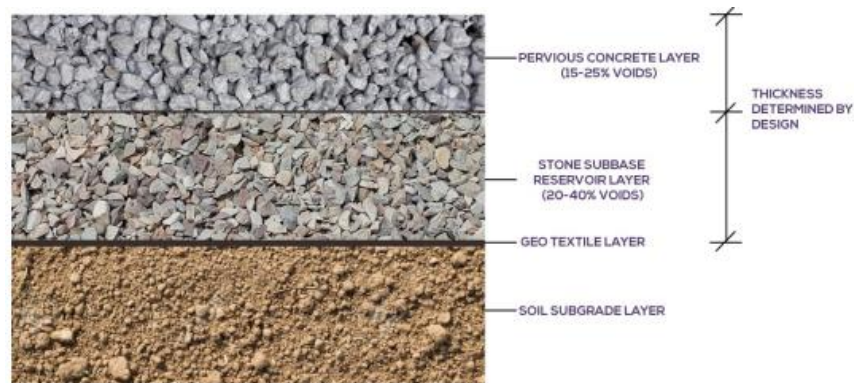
4: Typical section of a pervious pavement (Ahmed, T., & Hoque, S. 2020).
